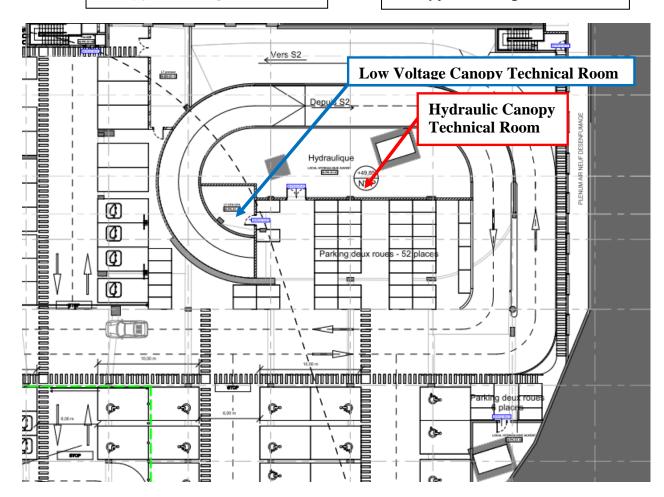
Location of technical rooms in the first sub-basement of Pavilion
